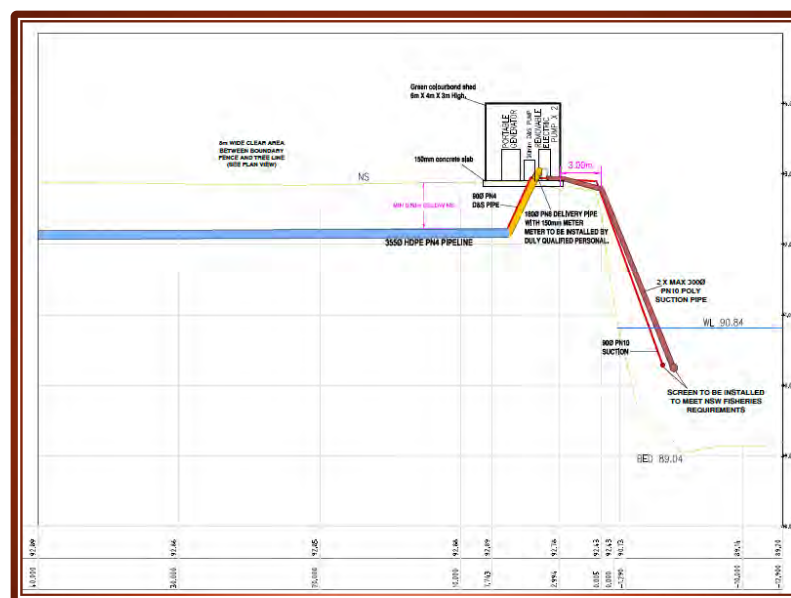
Image showing cross section of project pump site (Source Rich River Irrigation Developments Plans)
